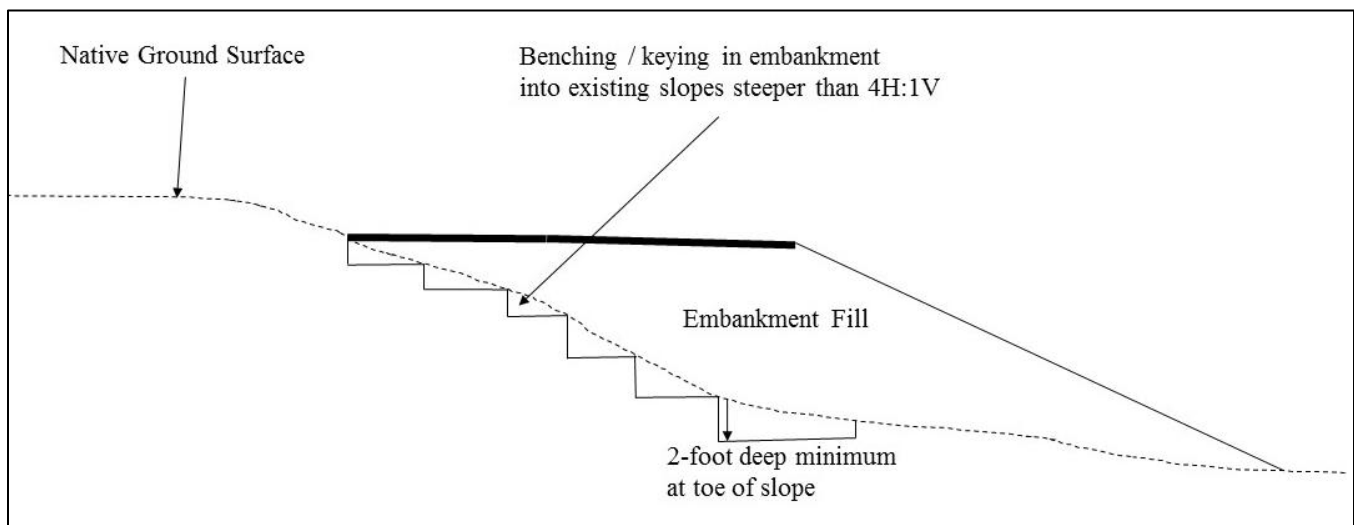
Generalized embankment cross section illustrating proper benching requirements when a new embankment is constructed onto an existing slope steeper than 4H:1V.
